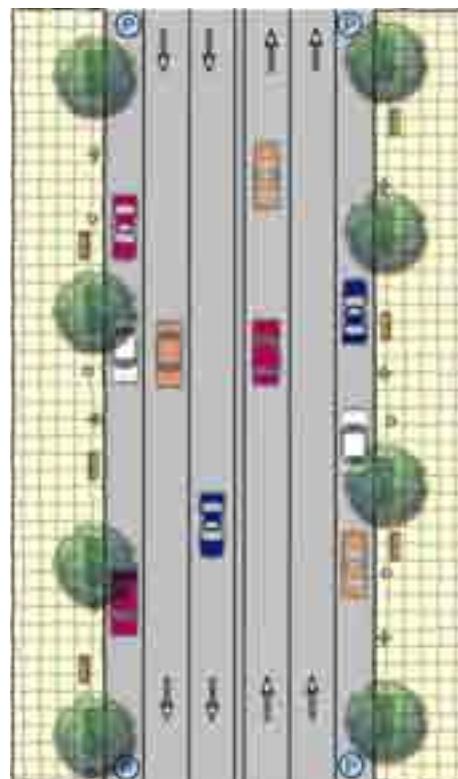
A - 14th Street Existing Lane Configuration from Wallach Place to Florida Avenue; U Street
